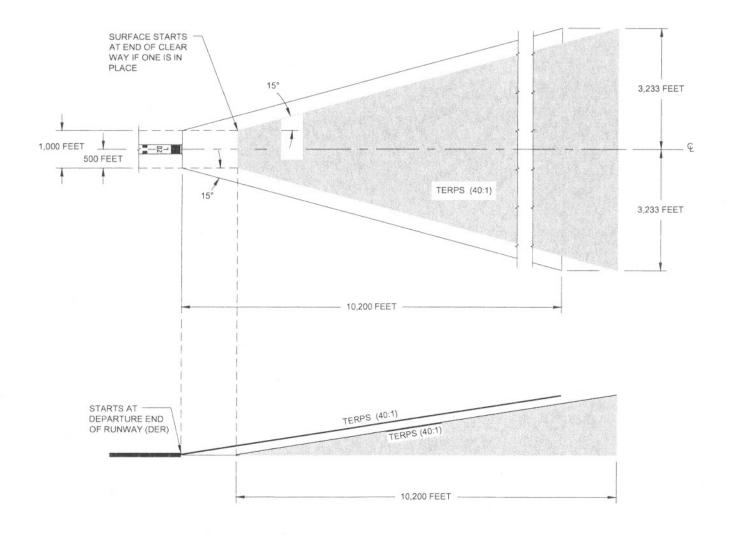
Departure surface for Instrument Runways TERPS (40:1)
